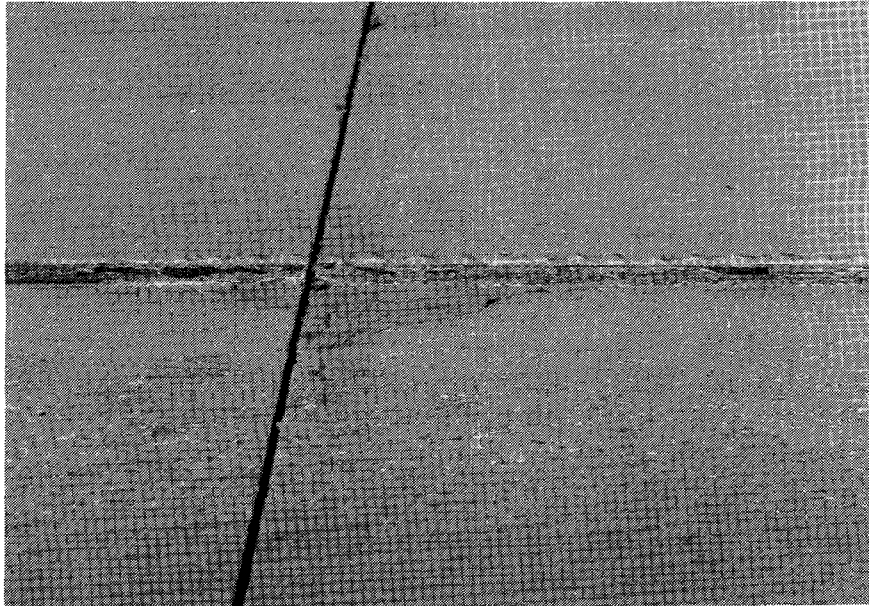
Illustration of "D" cracking rated "major" on a jointed concrete pavement (JCP-3-IL).
